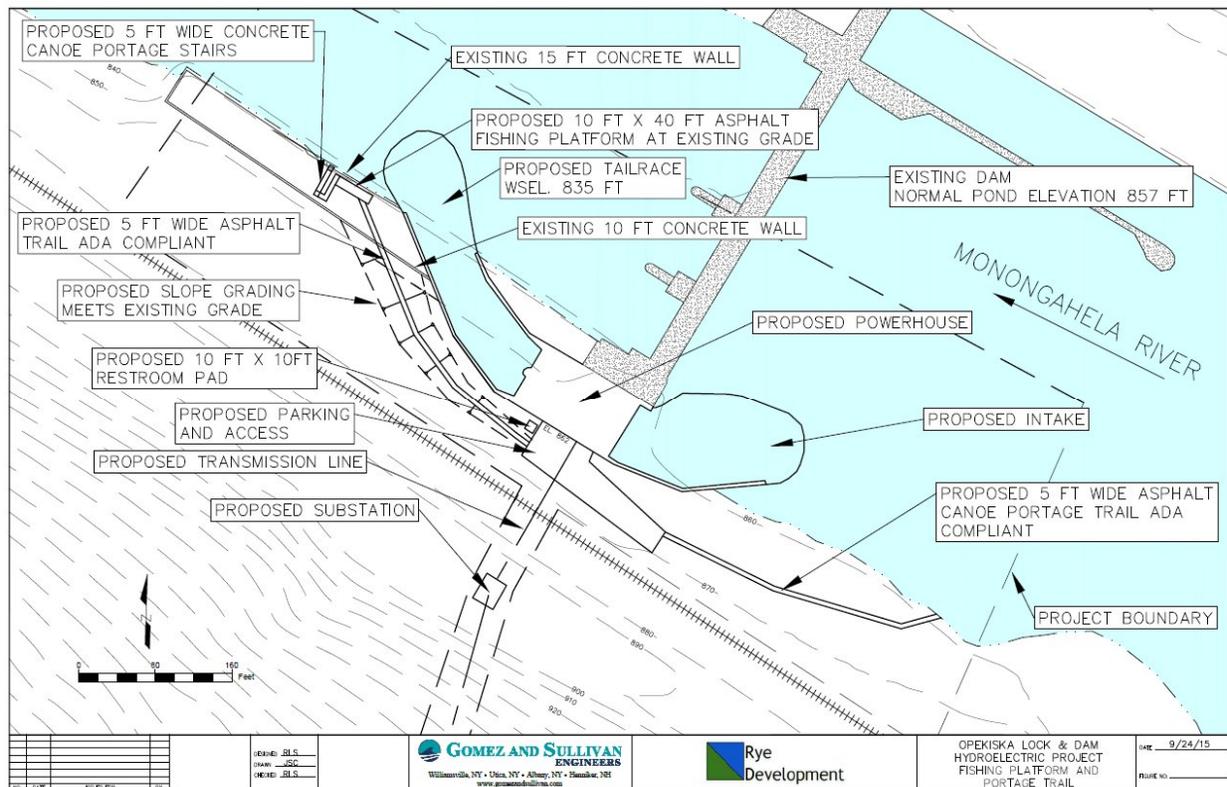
Recreation enhancement conceptual design plans, Opekiska (Source: Rye Development, 2015f).
